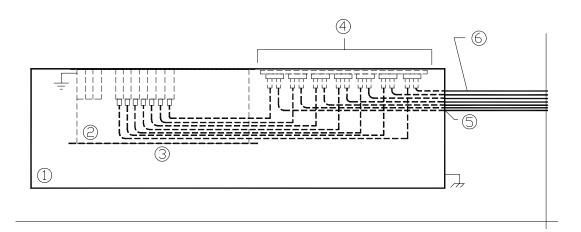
Typical Installation - Bulkhead Rack with External Termination I/O Modules, External Termination Blocks Installed Inside the Cabinet (Top View Shown).
